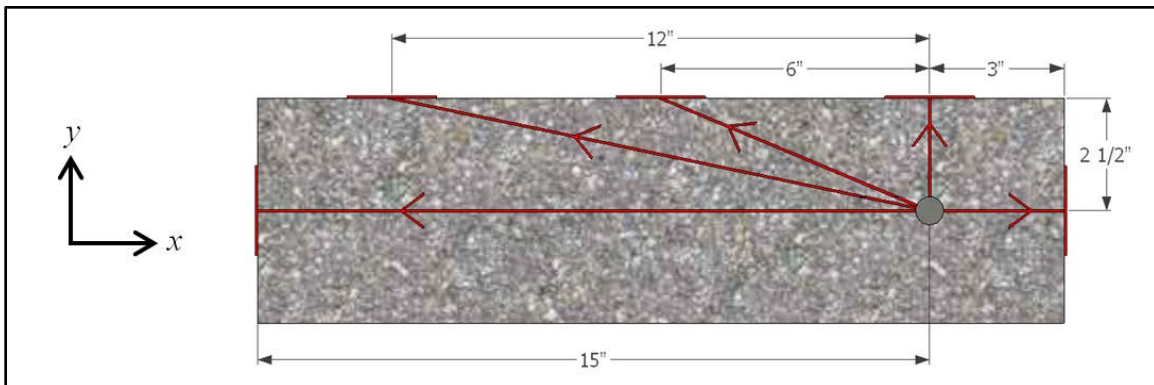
Paths of leaked waves from steel bar to array locations (x-y plane) (Specimen set 2).
